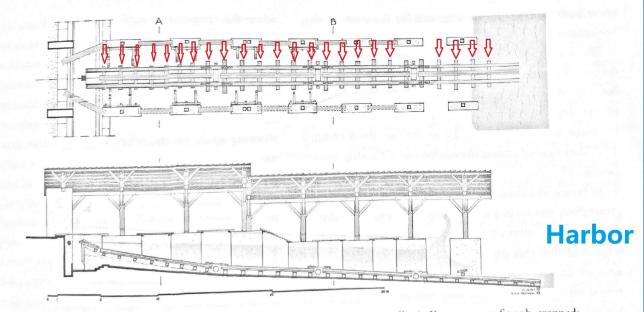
Reconstructed plan and section of a shipshed, Kition, Phase 1 (O. Callot in Yon 2000: 110 fig.11b, cropped; uncropped in BCH 124 [2000]: 681 fig. 40).
